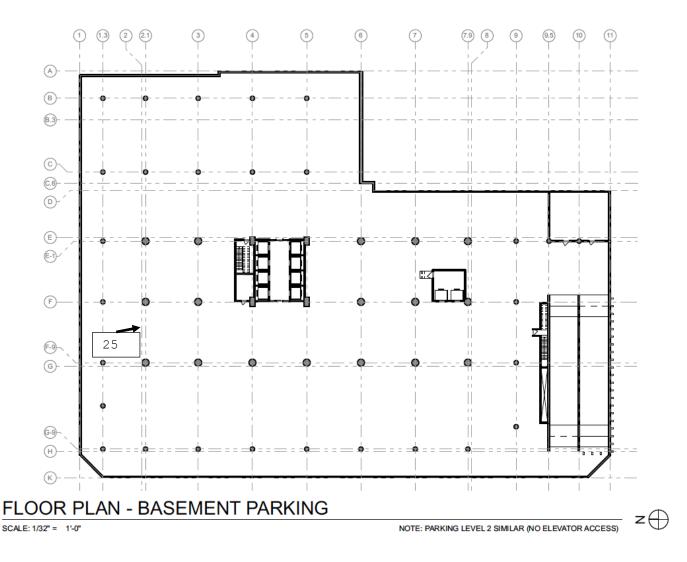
Photo Location Map showing P1 level of the underground parking garage in the Financial Center Office Building, Des Moines, Iowa. (Slingshot Architecture).
